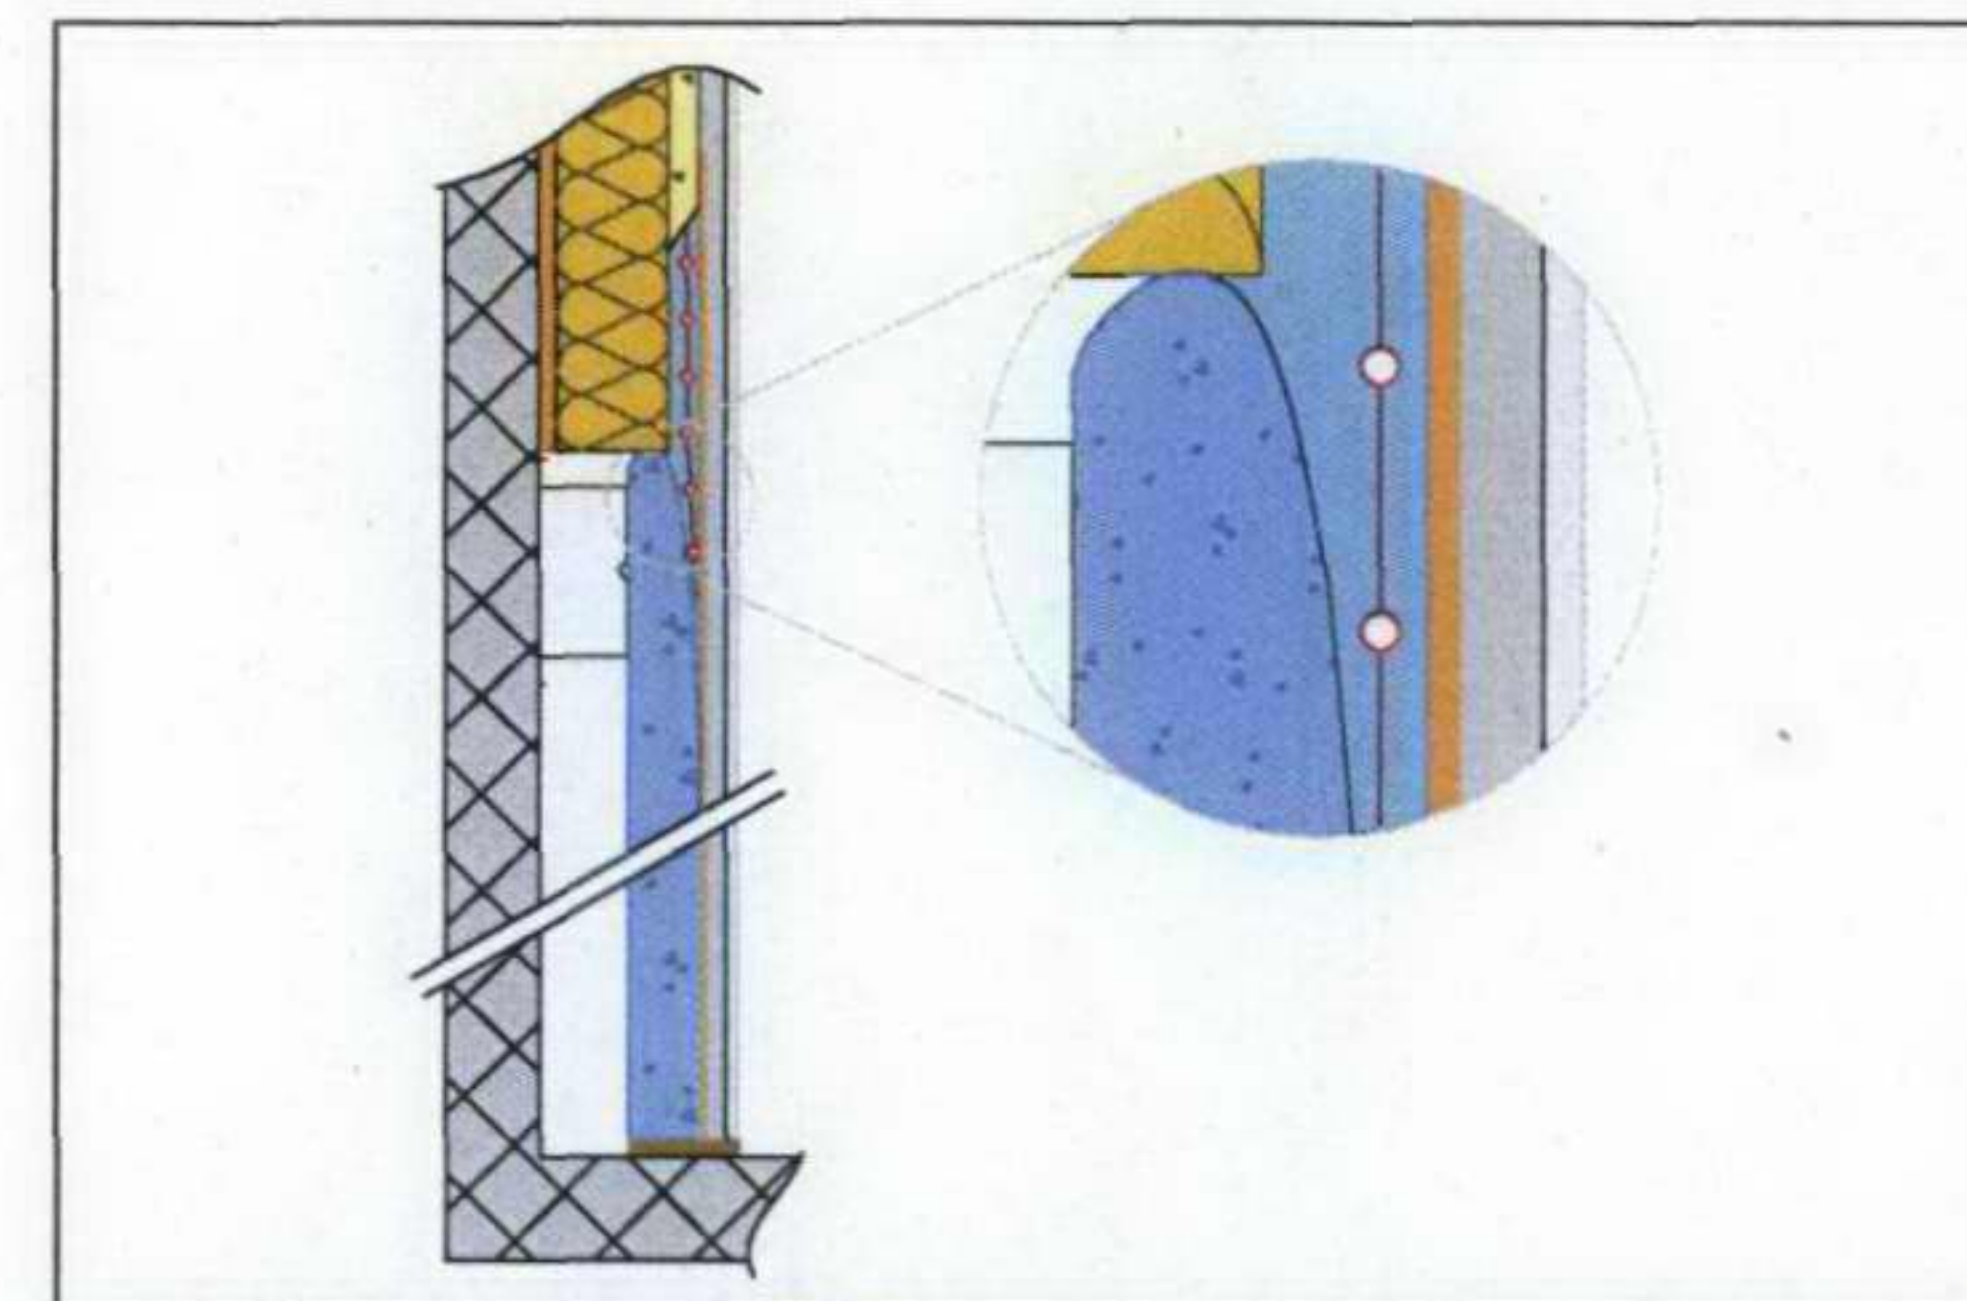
Wall construction with curtain walling (see drawing Z007)
